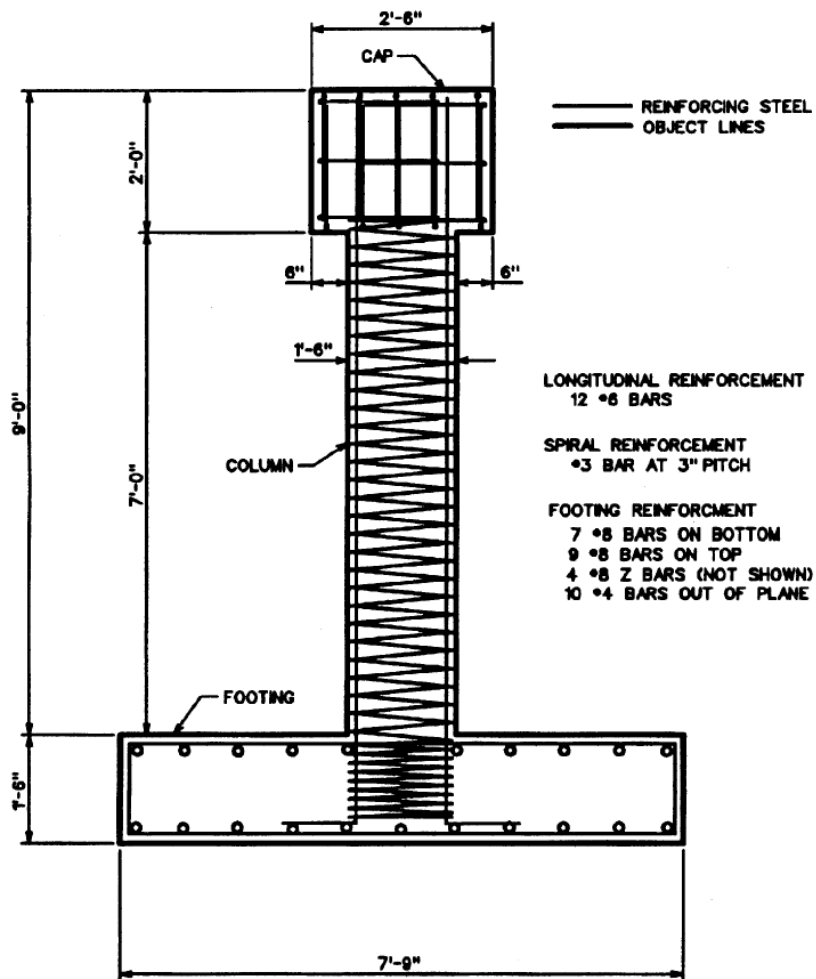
Typical Test Specimen Dimensions and Reinforcement Layout (Moyer and Kowalsky, 2003)
